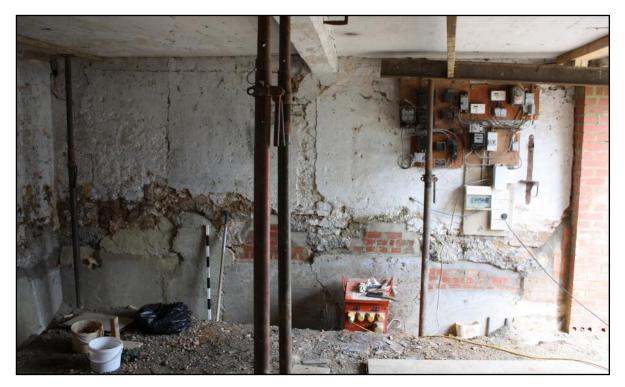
North end wall seen from the interior with new brick patching where the walling had deteriorated and in places found to contain soil.
